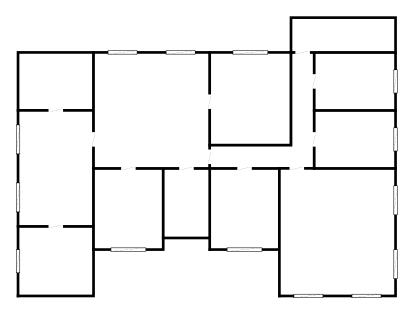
HOUSE LAYOUT FOR COOLING SYSTEM DESIGN TASK.
